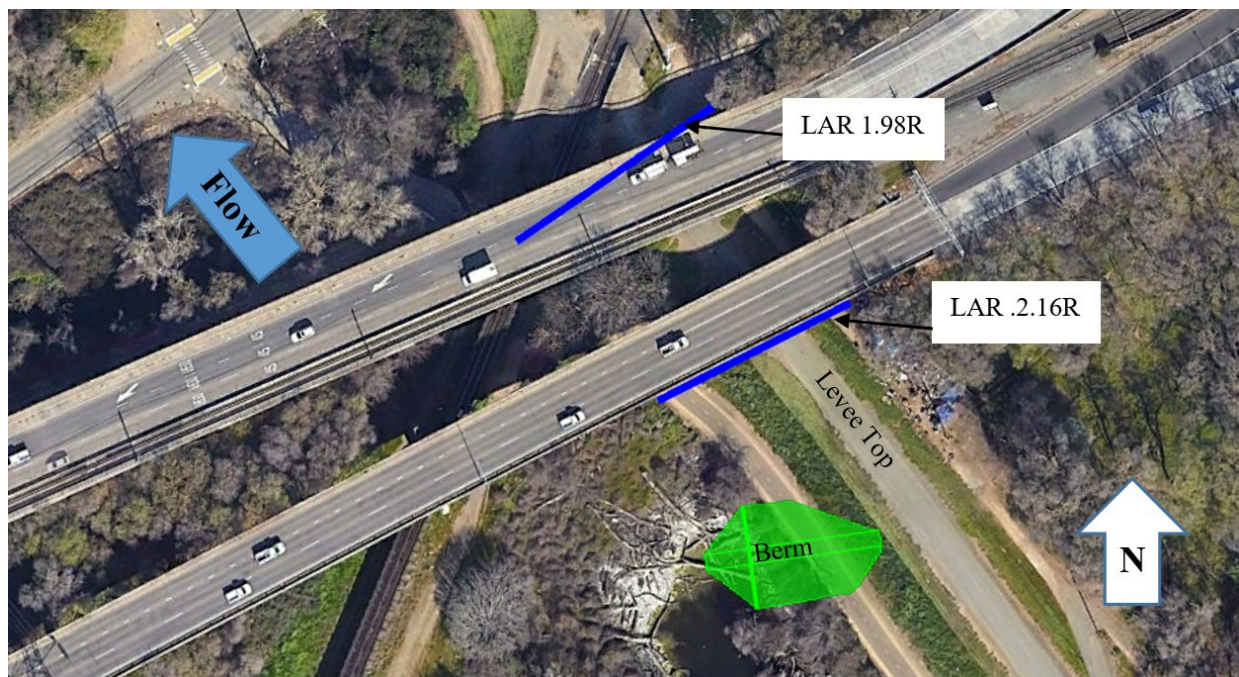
Berm design upstream of highway and railroad bridges showing LAR 1.98R and LAR 2.16R BSTEM cross-section locations
